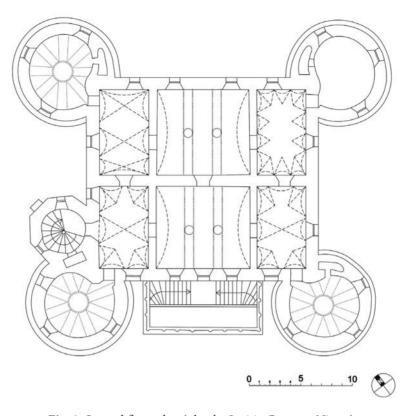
Second floor plan (plan by Letiția Cosnean Nistor).
